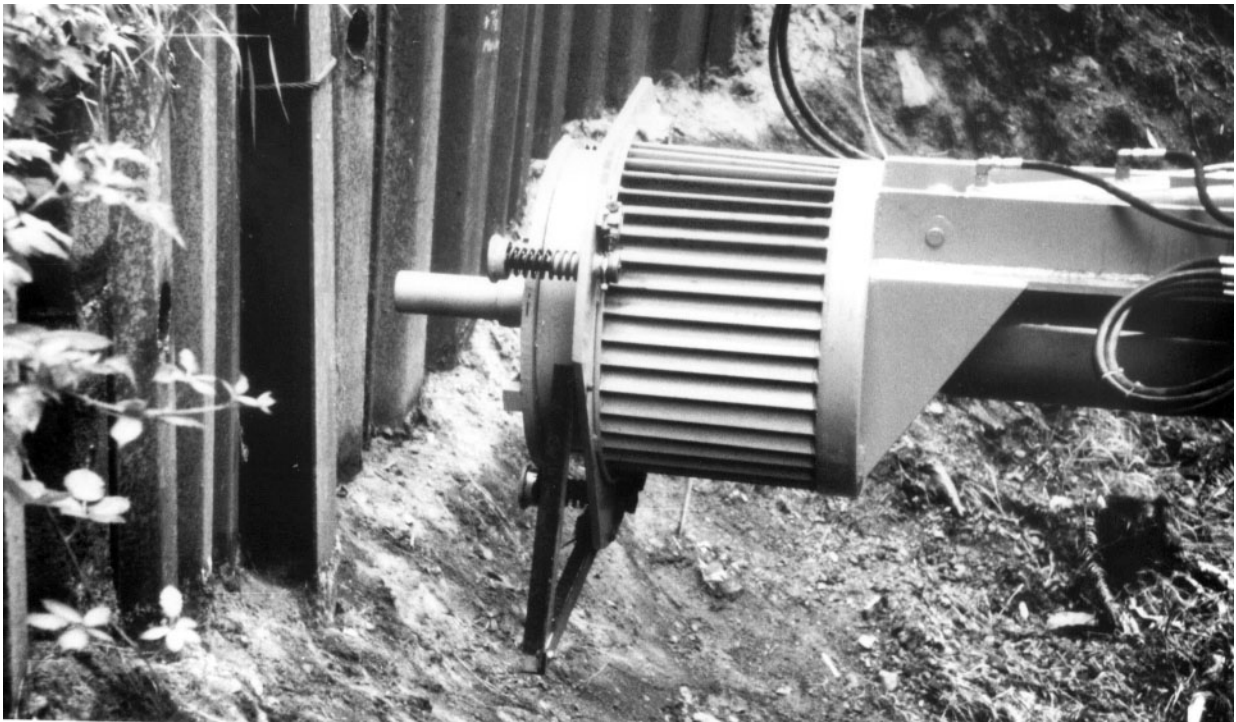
A driven sheet pile 1H-pile retaining wall in Oregon. Note the holes burned into the sheet pile for the launched soil nails.
